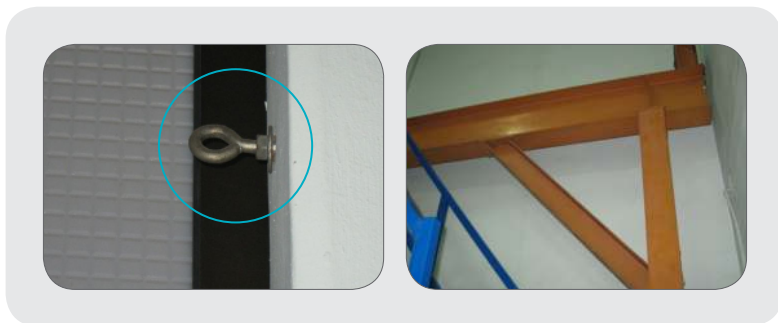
An eyebolt (left) and steel beams are classified as anchors.
